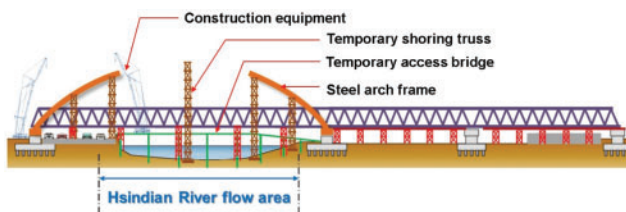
Original idea of the design and construction of the Anhsin Bridge¹¹
